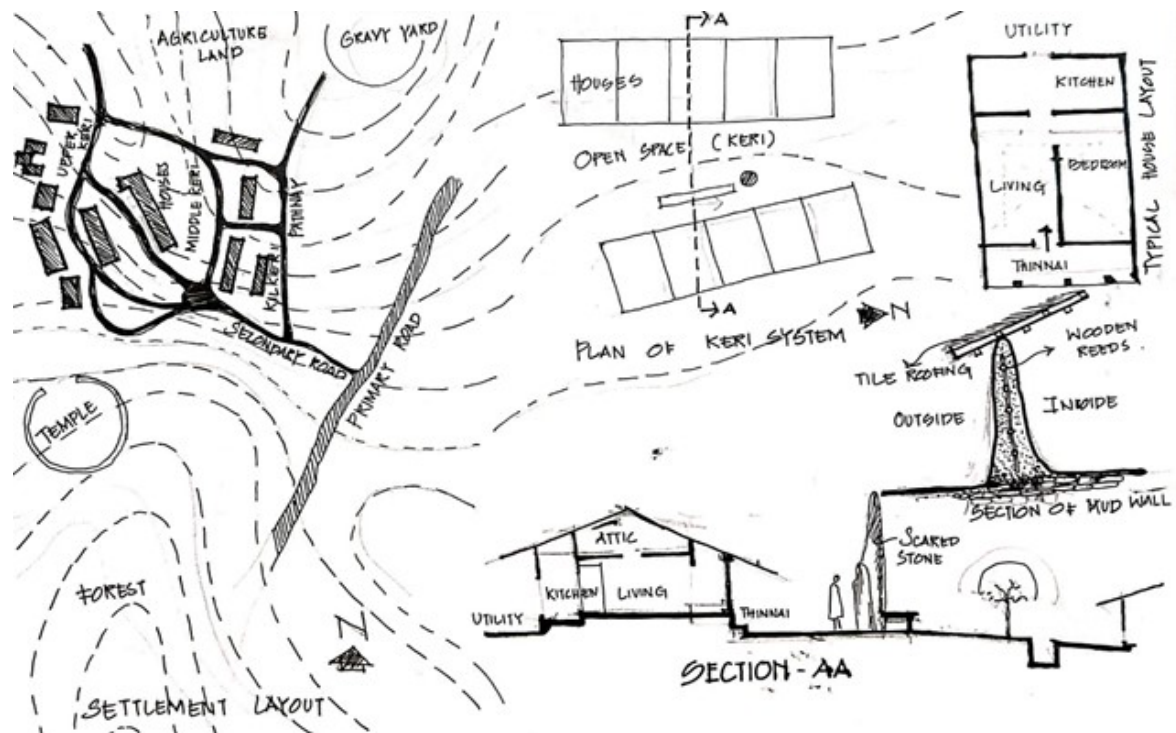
Settlement plan and typical layout with construction details of Kota settlement at Sholur. Source: Author
